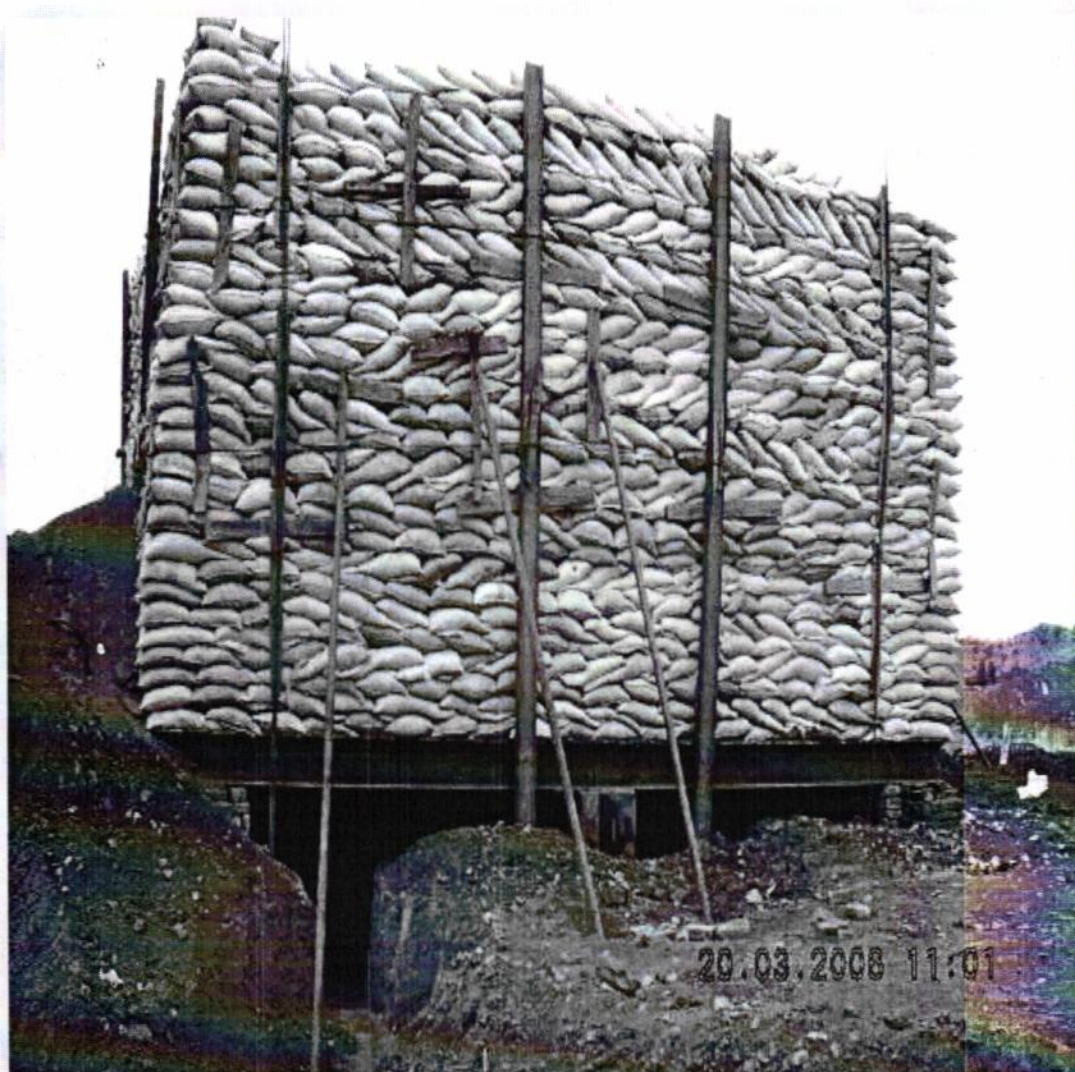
A view of soil filled bags on loading platform to obtain dead load reaction
